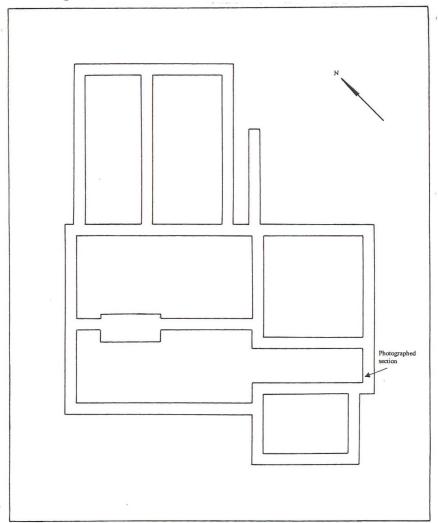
Ground plan of foundation trenches (Scale 1:200)
